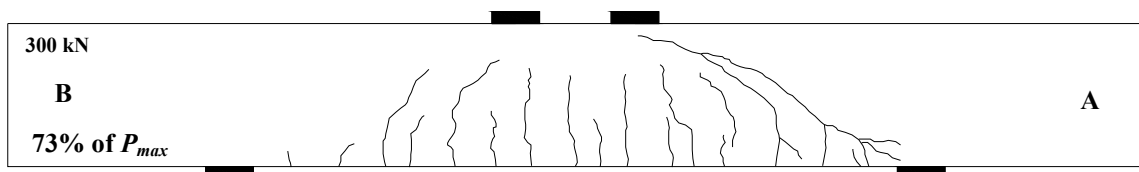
Crack development of specimen MW3-2 at 300 kN
